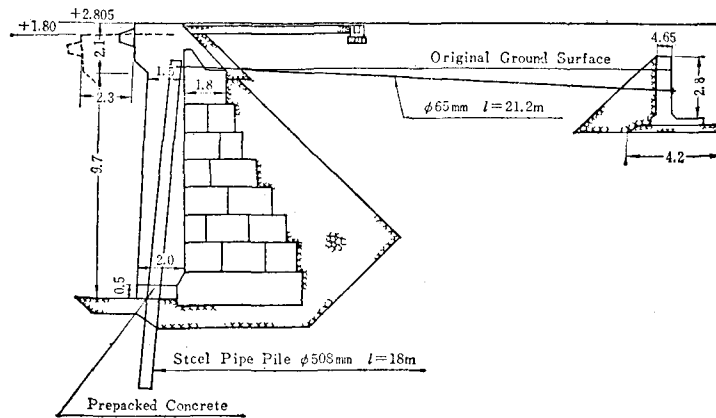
Cross Section of Quaywall in Central Pier in Niigata Port
